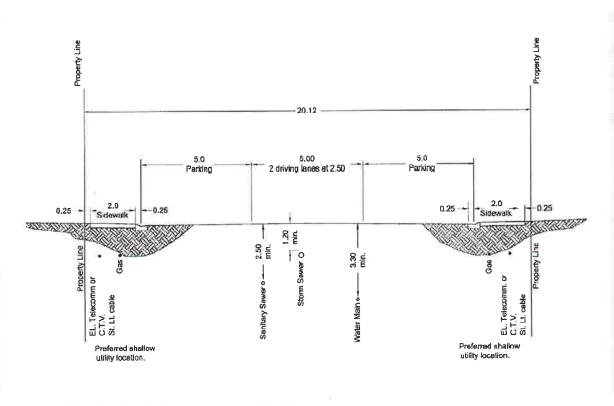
Angle Parking Road Cross Section (as shown in the 2004 ARP)
